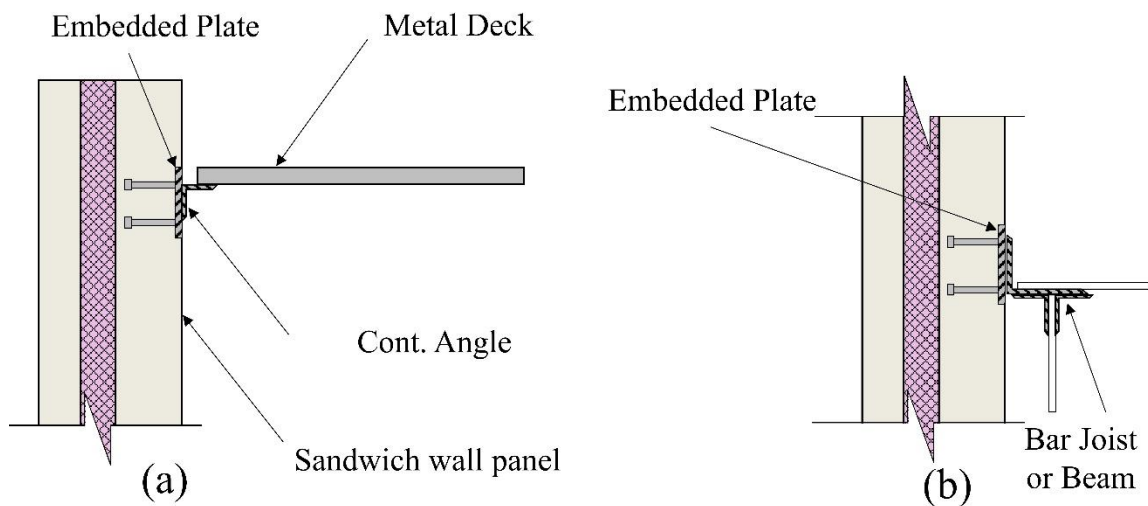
Sandwich panel wall connections (a) load bearing for metal roof (b) panel to intermediate floor connections.
